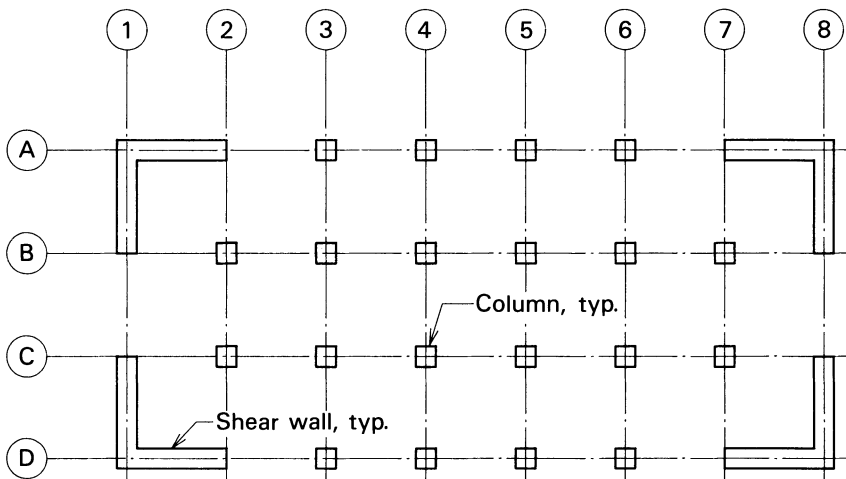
Plan of rectangular building having a prestressed-concrete roof and shear-resisting walls at the corners.
